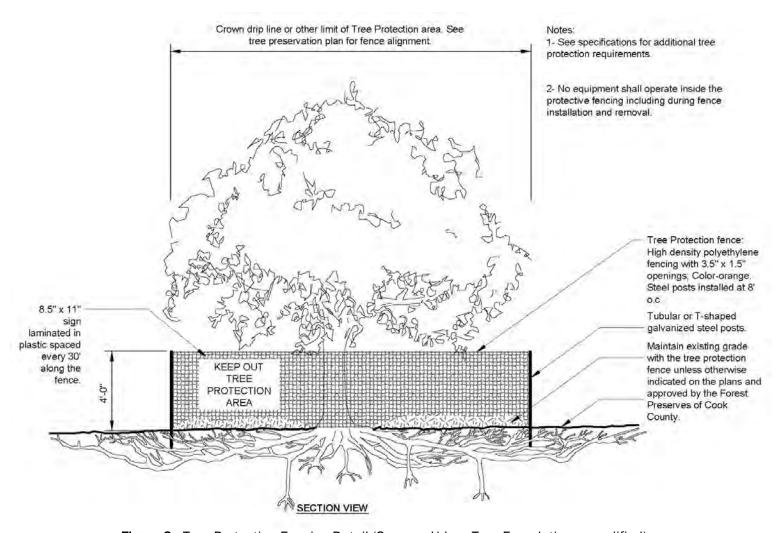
Tree Protection Fencing Detail (Source: Urban Tree Foundation – modified)
